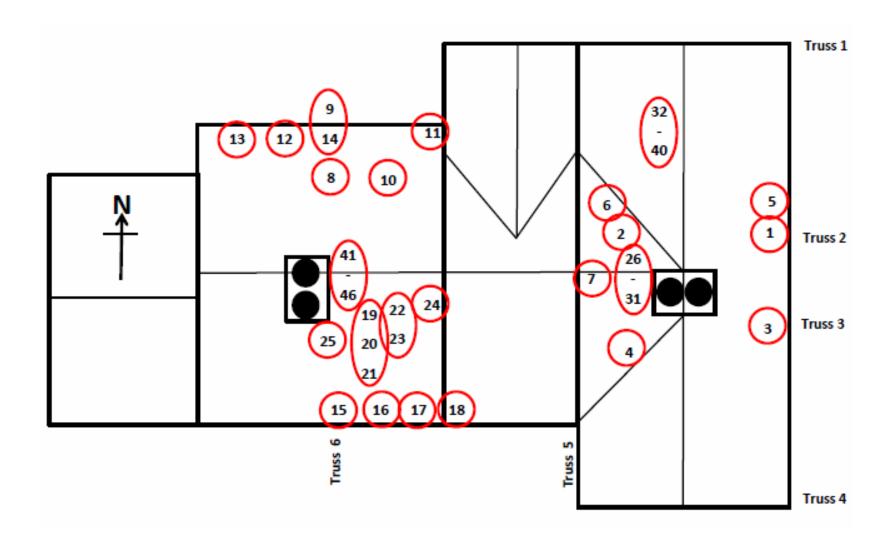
Simple schematic plan of Tonge Hall to show arrangement of the rooms and the general location of the sampled timbers
